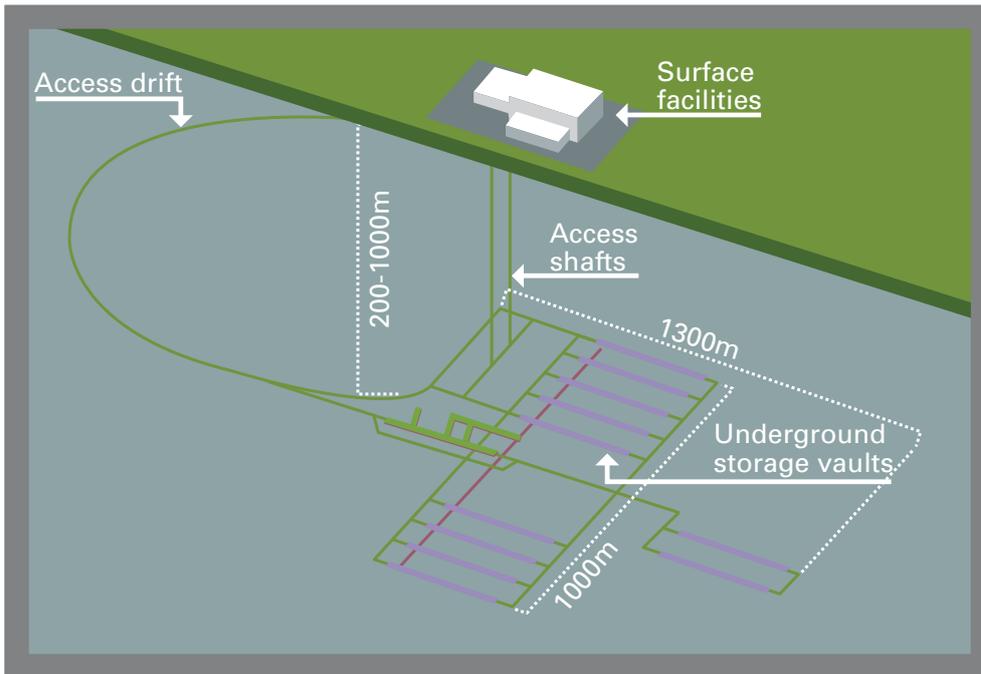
A generic design for ILW disposal concept: the waste would be immobilised in concrete and placed underground
